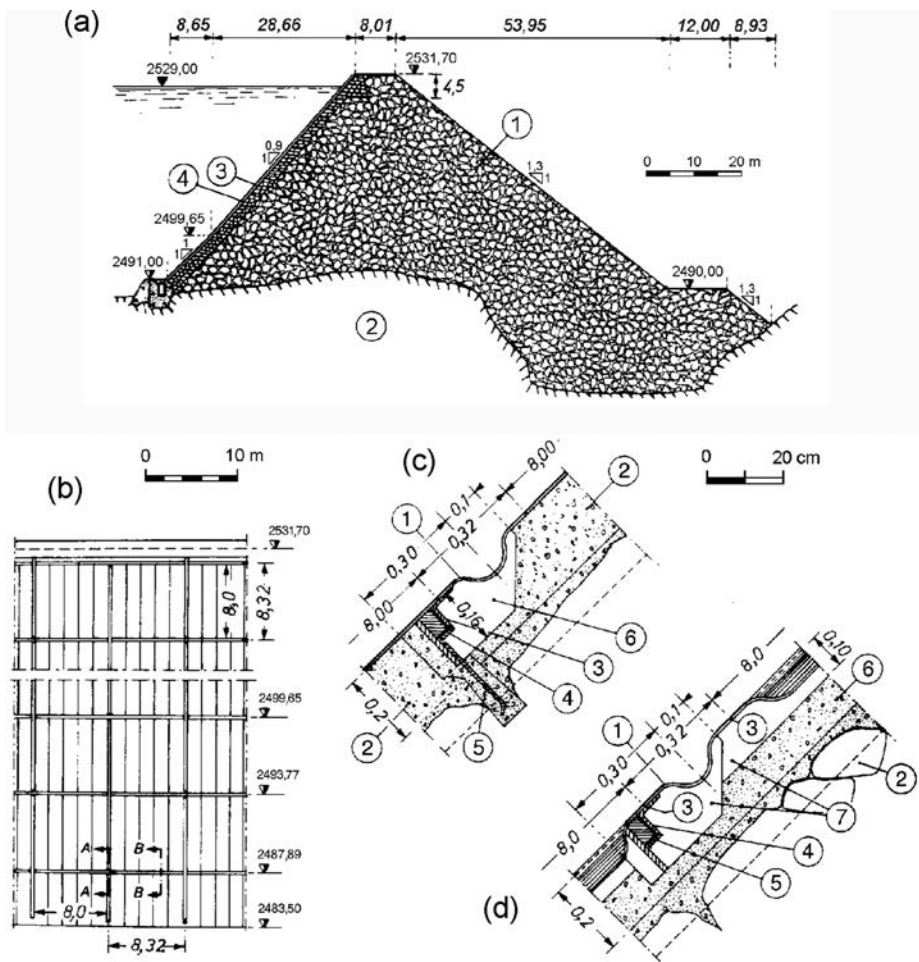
Lago Verde dam, with steel facing (after INCOLD, 1988). (a) Cross-section: (1) rockfill; (2) diorite; (3) steel facing; (4) dry sub-facing masonry; (b) elevation of facing; (c) section B–B: (1) joint of concave omega-plate, 4 mm thick; (2) porous concrete; (3) steel angle; (4) steel plate; (5) anchor; (6) groove; (d) section A–A: (1) joint; (2) dry masonry; (3) welded joint; (4) angle bar; (5) plate; (6) porous concrete; (7) groove.
